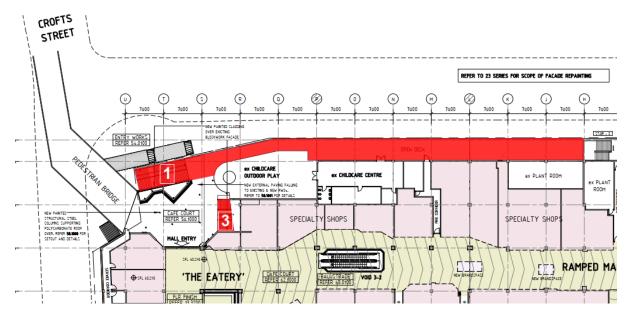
Stairs 1 Located on Cross Street that links at L3 to stairs 3.
